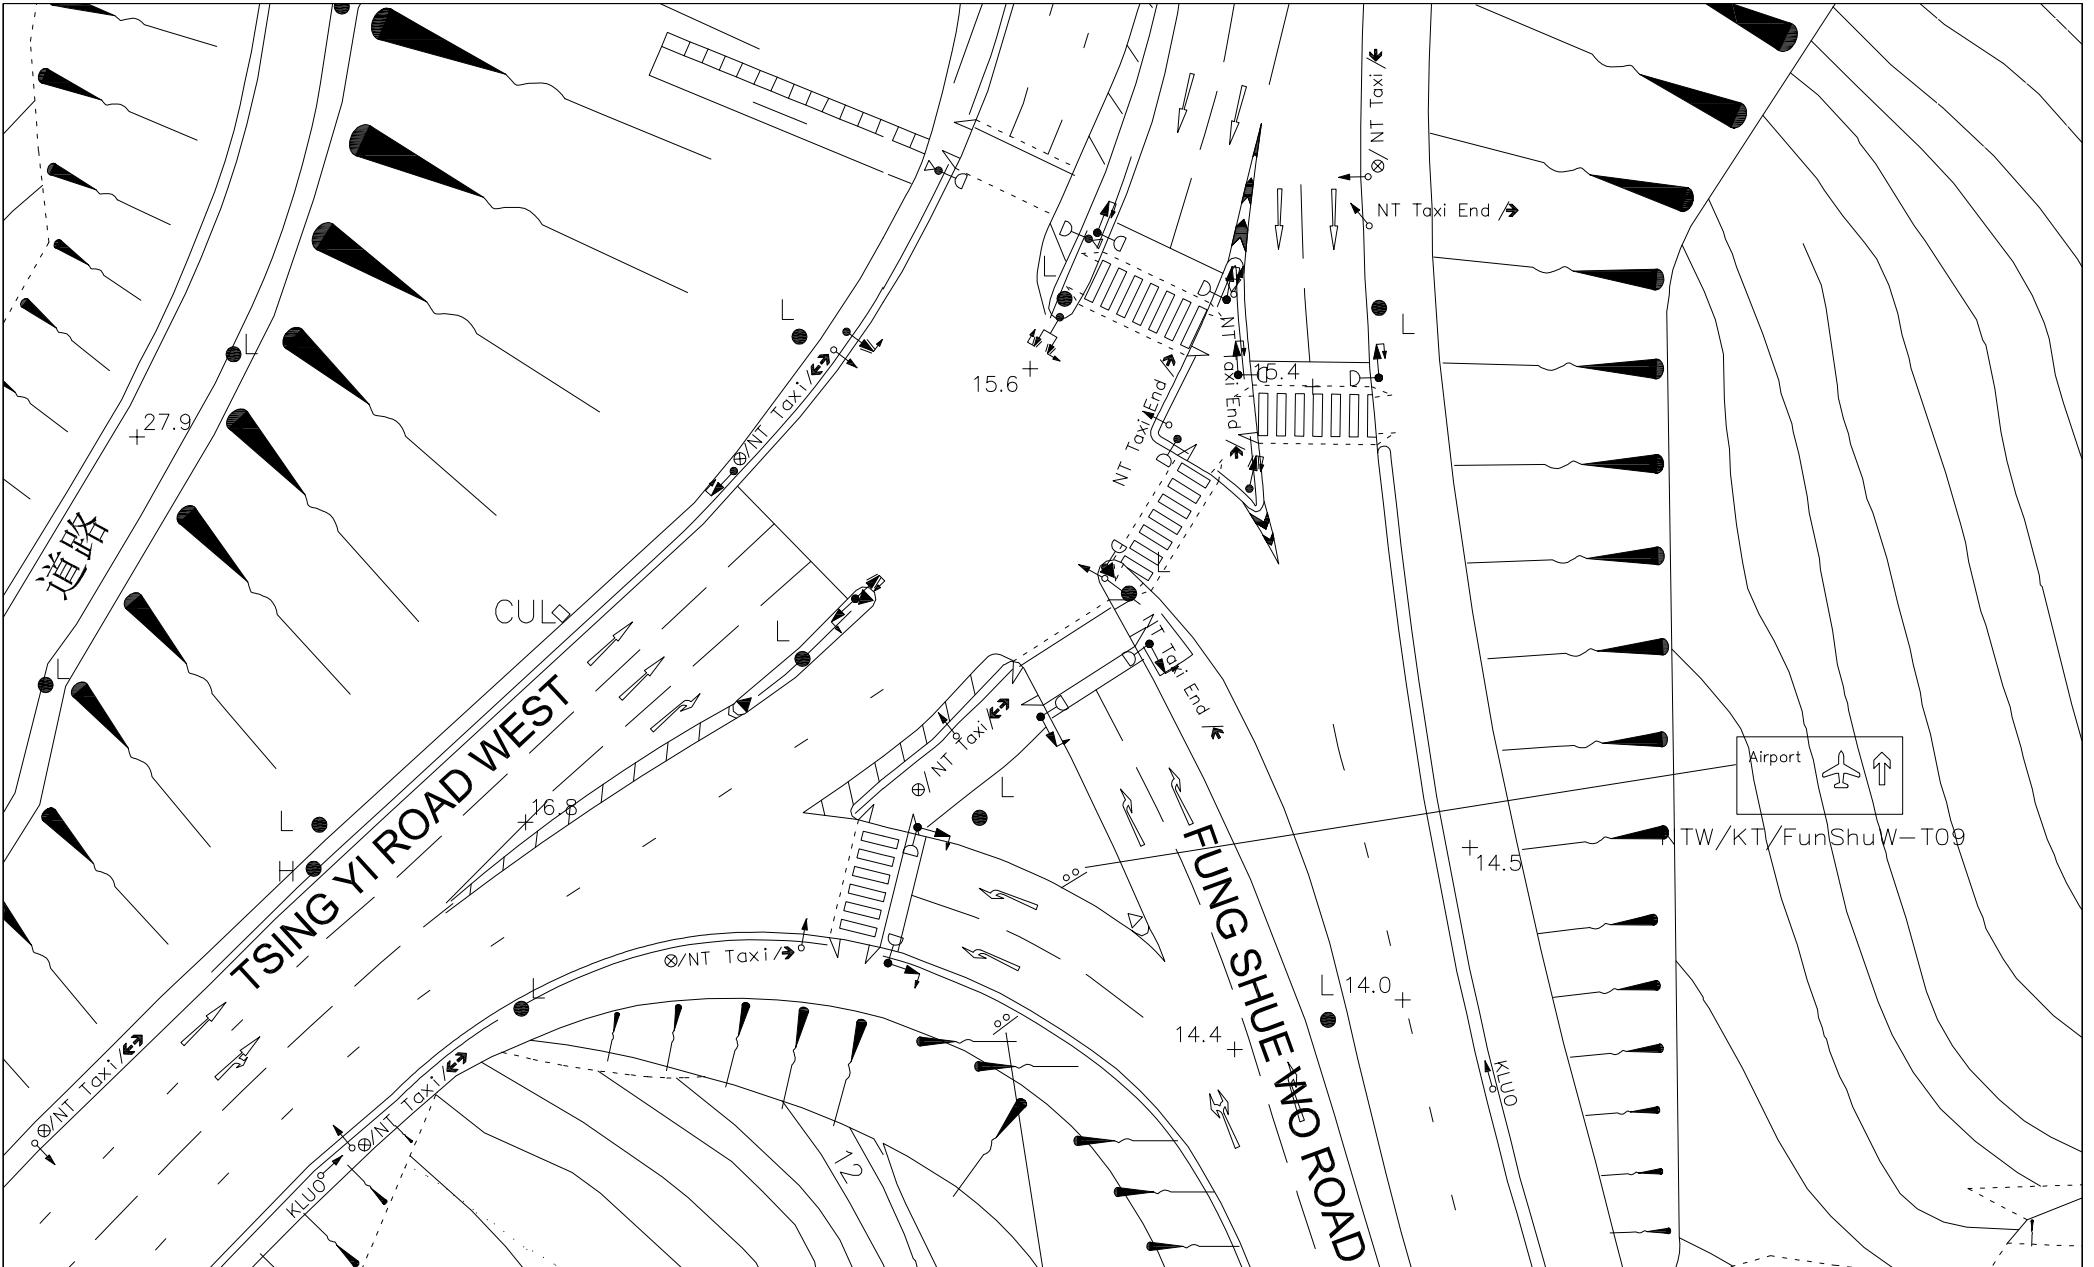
PROJECT TITLE:	Concrete Batching Plant at Tsing Yi - Renewal Application A/TY/136
